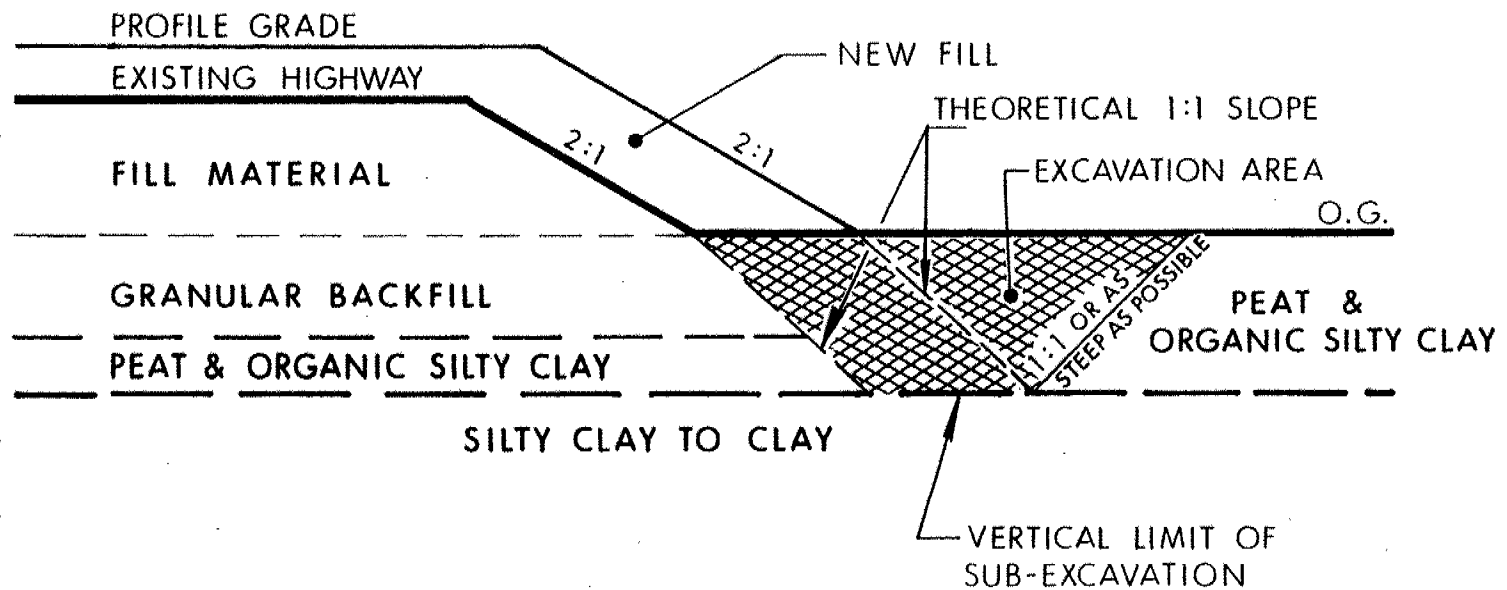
SKETCH FOR SUB-EXCAVATION AND EMBANKMENT CONSTRUCTION
